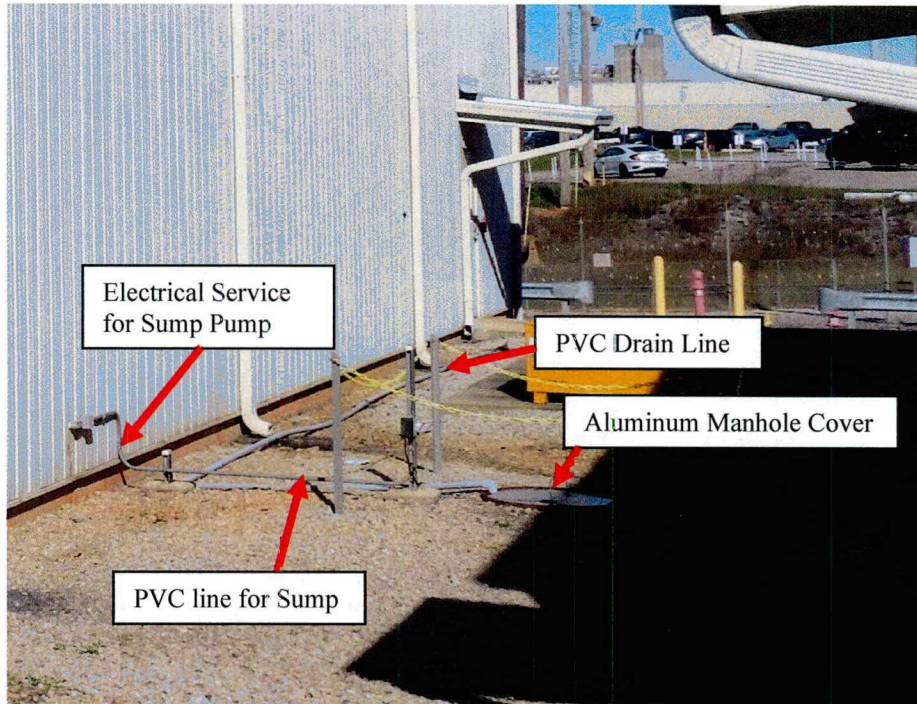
Manhole Between Buildings 233-23H and 233-24H
